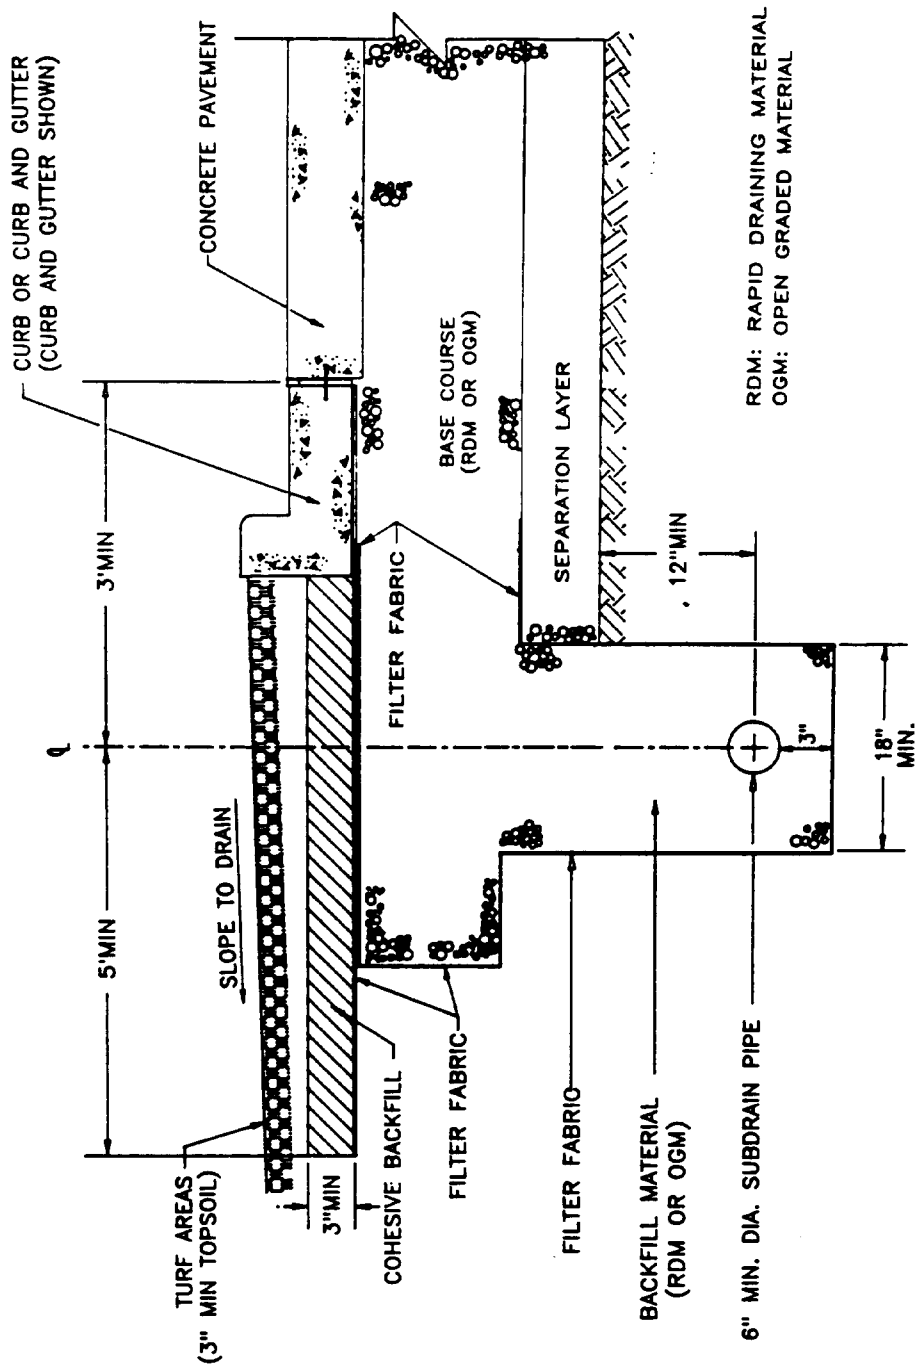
Pavement Edge Subdrain for Concrete Pavements
